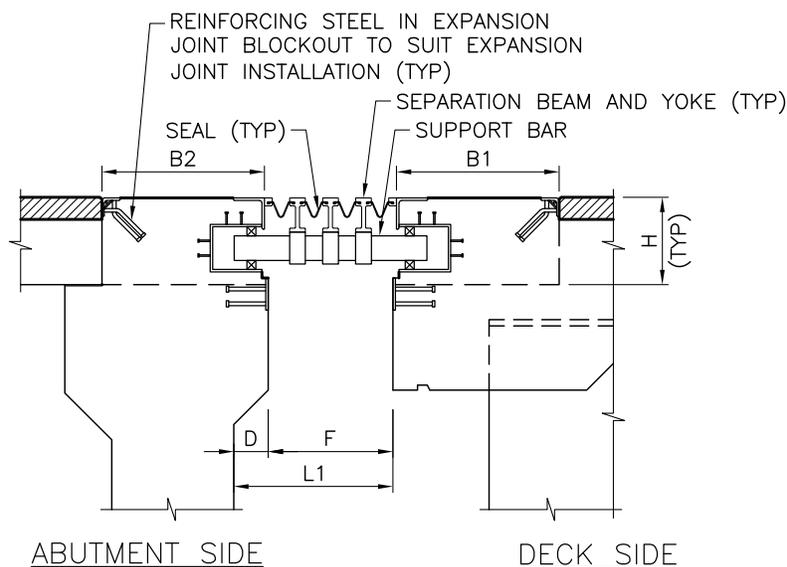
Modular Joint Detail – Section at Boxes (Single Support Bar System)
